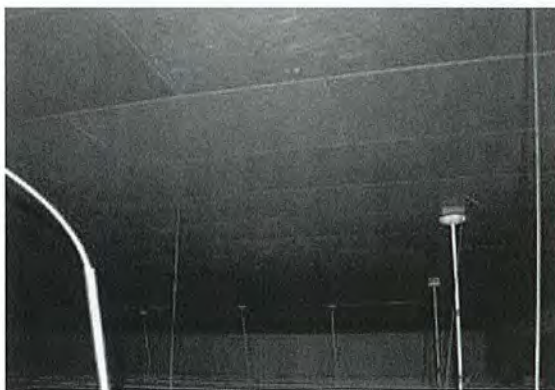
Nu-wood ceiling from original auditorium. Camera facing south.
